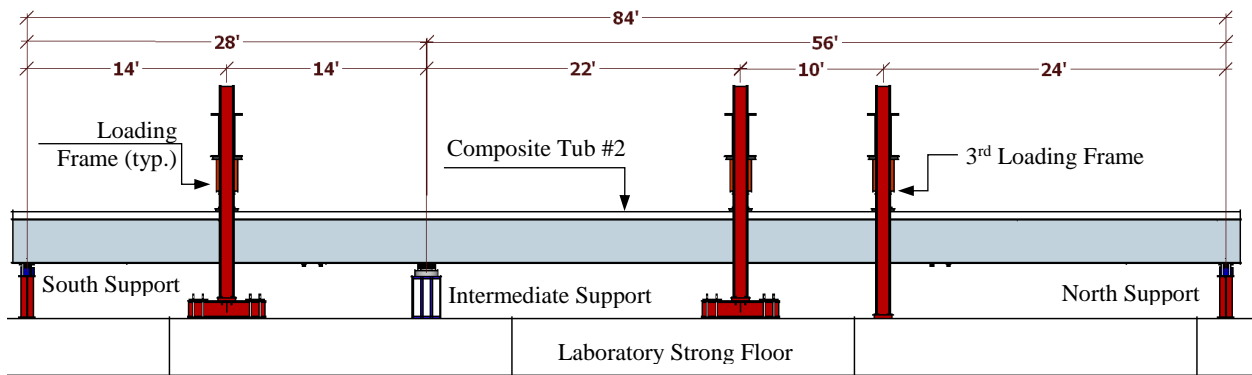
Continuous Girder Test Setup - Tub #2
